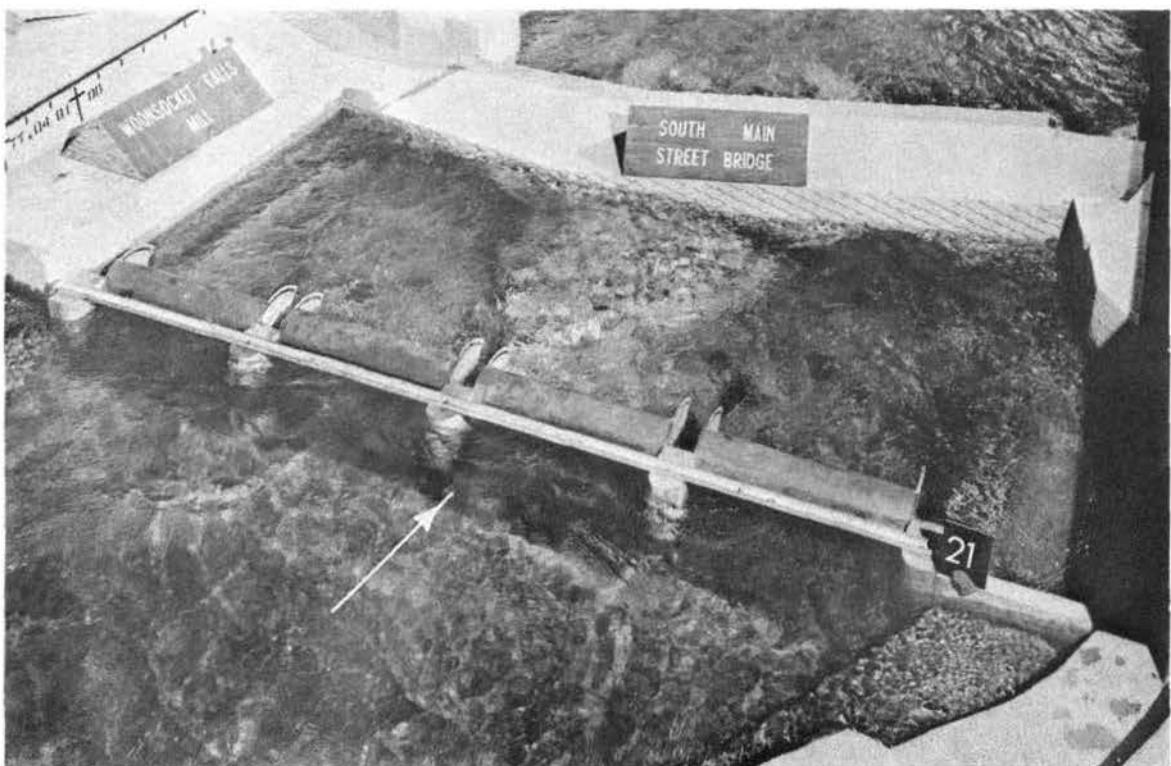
Plan A: Rock excavation on the left side of the channel below the west arch of the South Main Street bridge with channel flare reduced to 15 degrees
